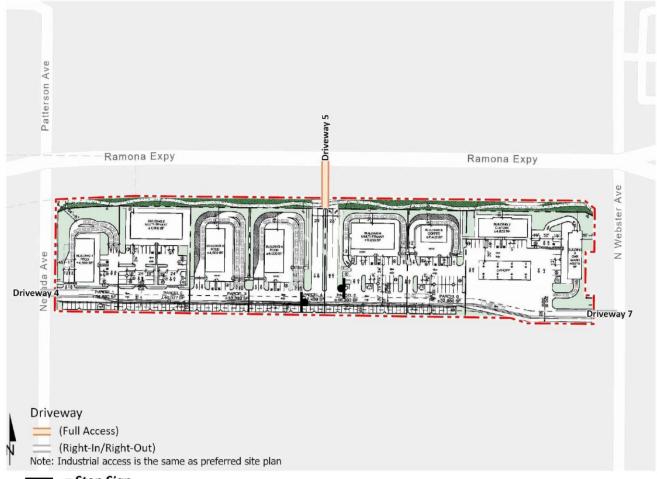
PRELIMINARY SITE PLAN
